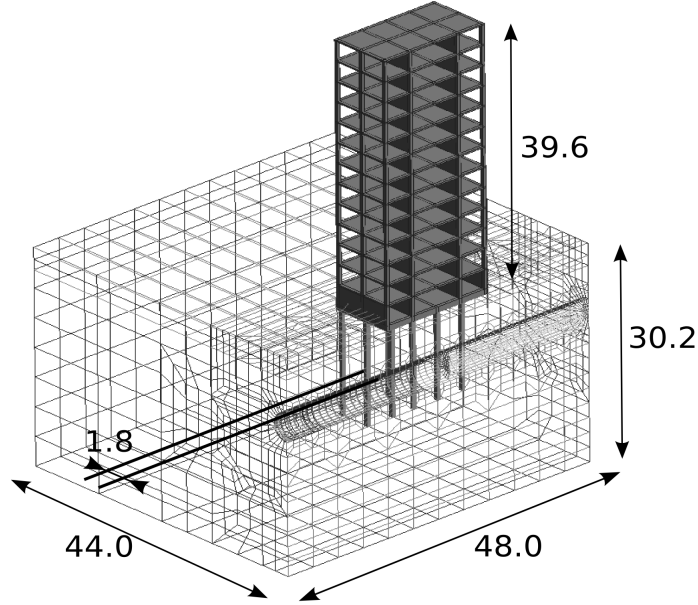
Modeling of TBM driven tunnel construction beneath a high building resting on pile foundation: Geometry and FE discretization (dimensions in [m])
